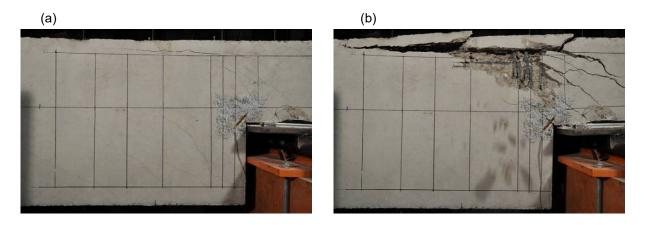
Failure of test DEB-1.6 (T1): (a) view at peak load and (b) view one second after peak load.
